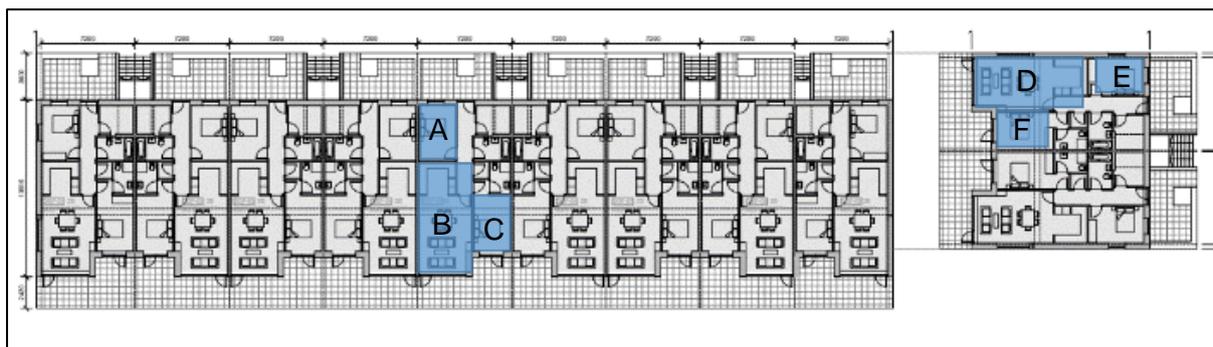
Block D&E – Ground Floor Assessed Rooms Highlighted in Blue
